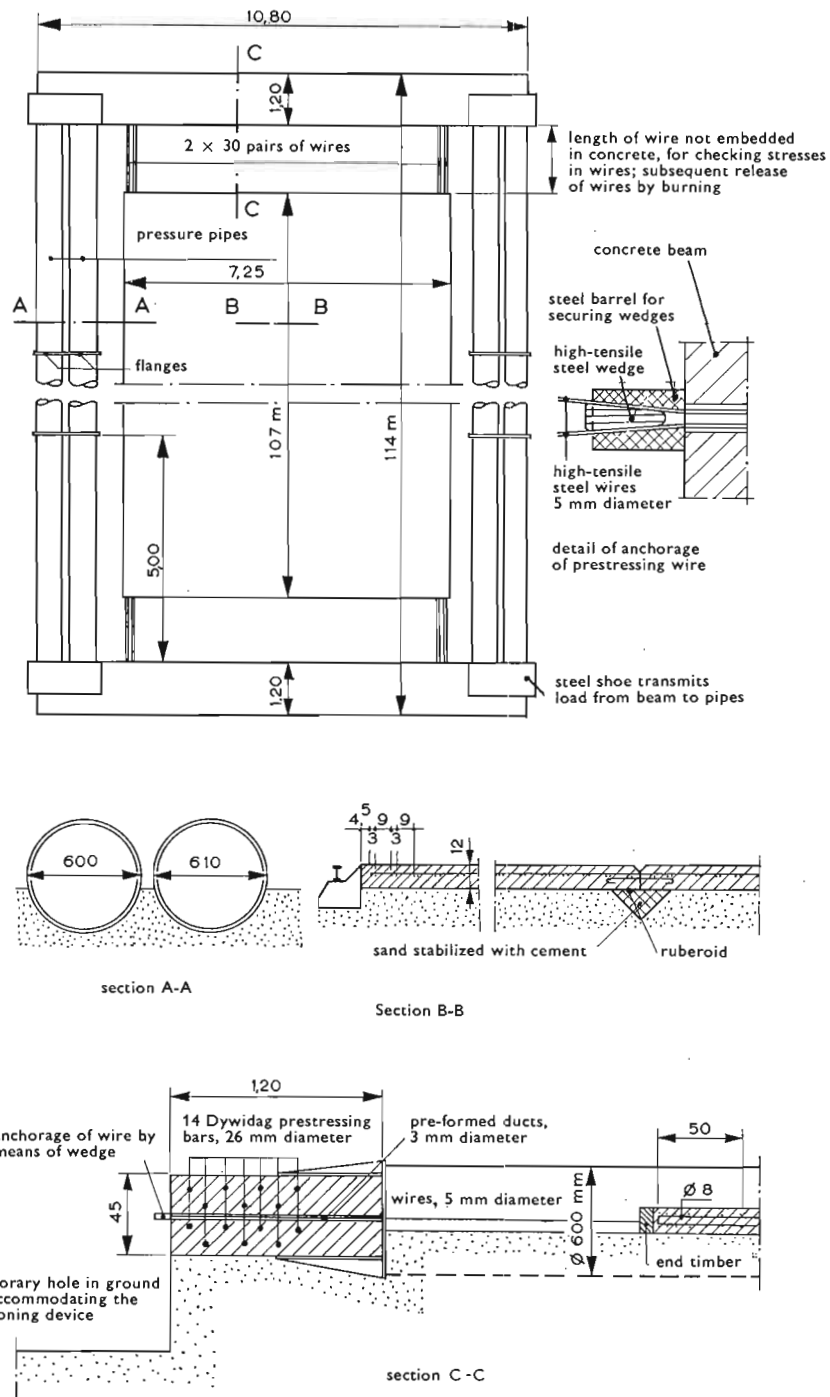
Diagram showing sections through prestressed experimental slab and pre-tensioning frame at Leidschendam
